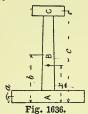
Obtaining Centre of Gravity of Cast-Iron Girder.
